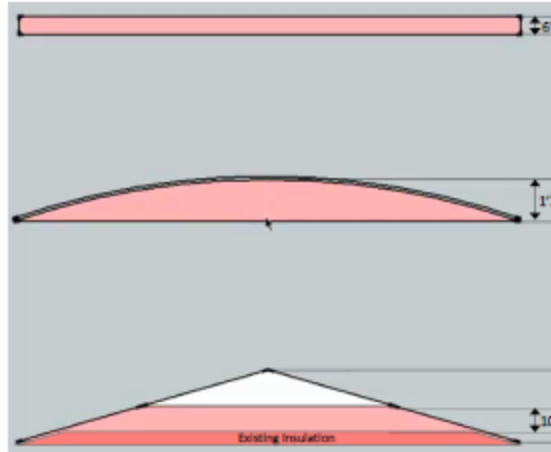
Section drawings of manufactured home roof configurations (from top to bottom: flat roof, bowstring roof, pitched roof).
